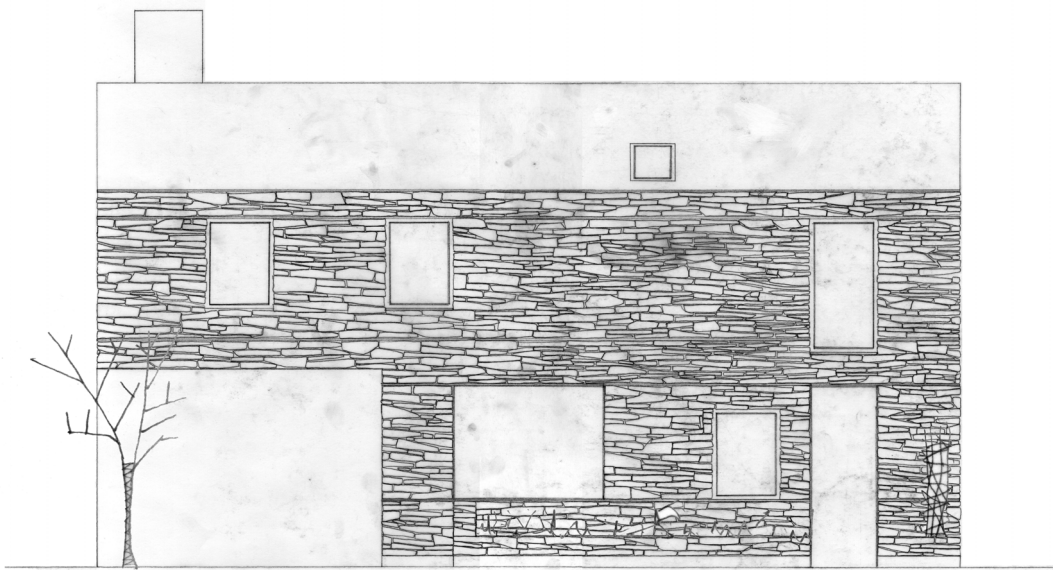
Material study of north and south elevations with facades clad in local stone 1:100
